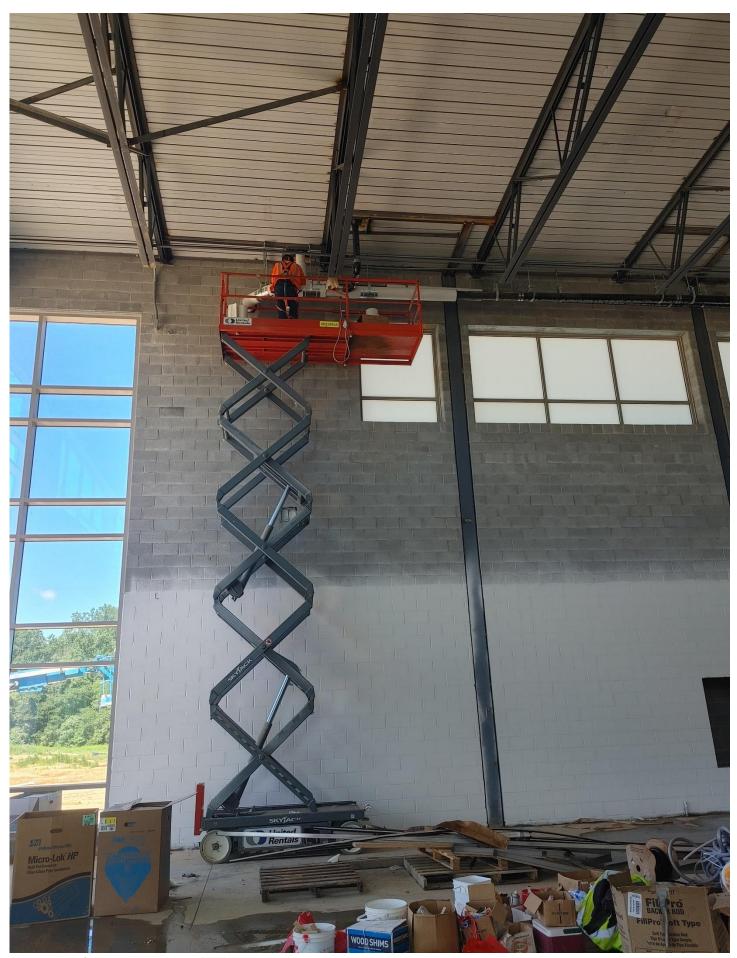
Roof Drain Pipe is being insulated in Area E.
